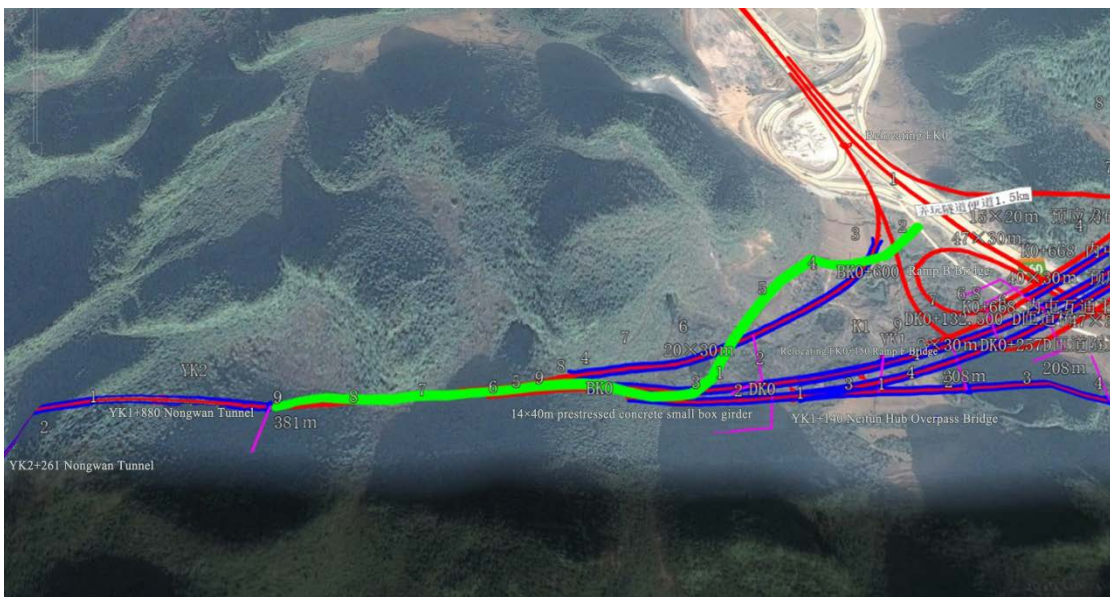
Location of New Access Road (1.5 Km) at Entrance of Nongwan Tunnel
